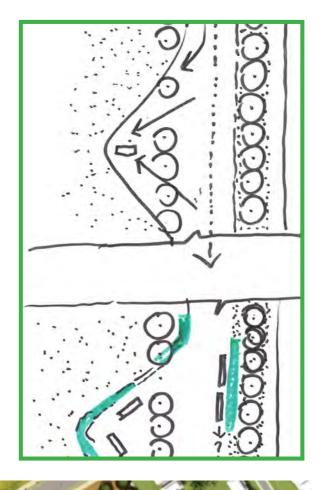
Welborne Park - Area 2 Boulevard illustrative plan
